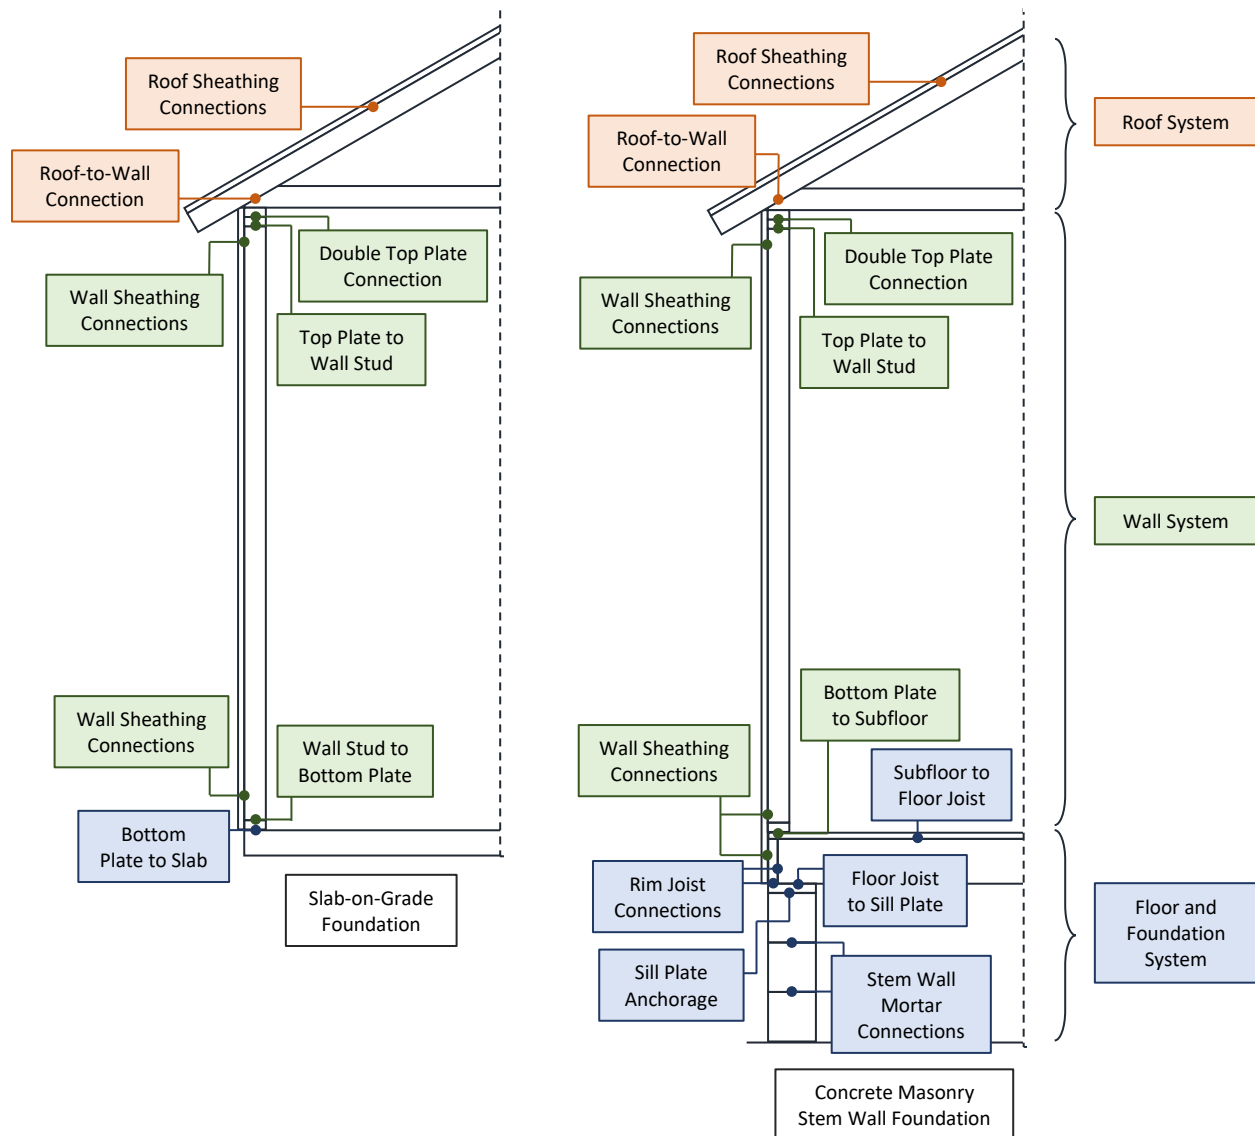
Exterior wall framing for a typical residential structure built on (a) a slab-on-grade foundation and (b) a stem wall foundation, illustrating the connections composing the vertical load path.
